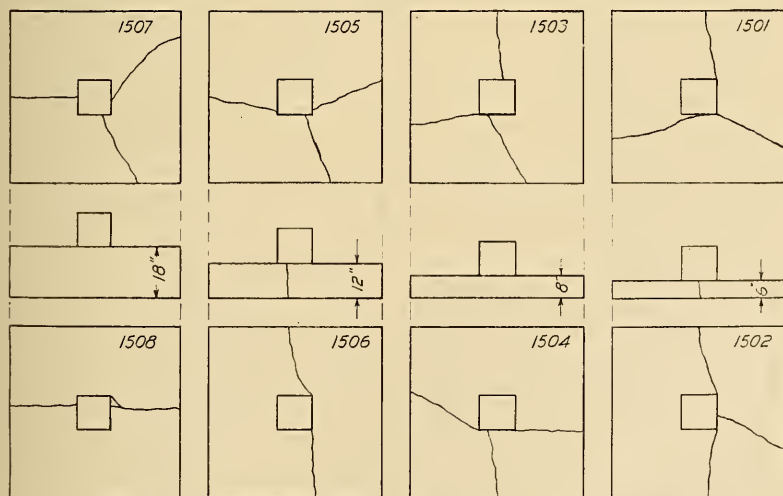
UNREINFORCED CONCRETE COLUMN FOOTINGS.
